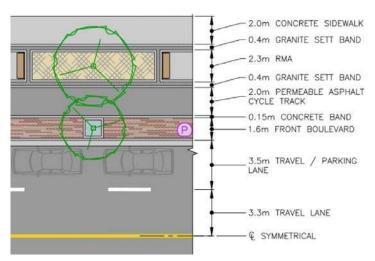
Typical Four-Lane Collector and Arterial Street Section
